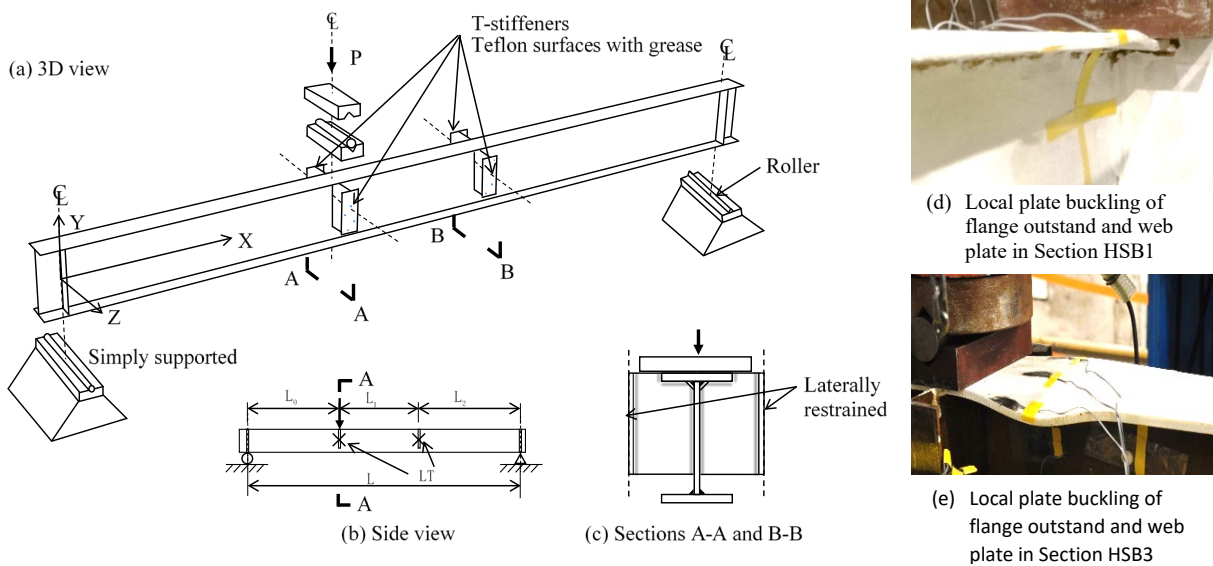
Typical set-up and failure modes of restrained beams of S690 welded I-sections
